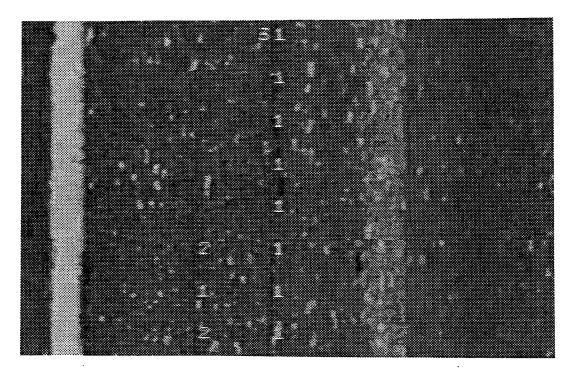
Natural Longitudinal Cracks at Davis
